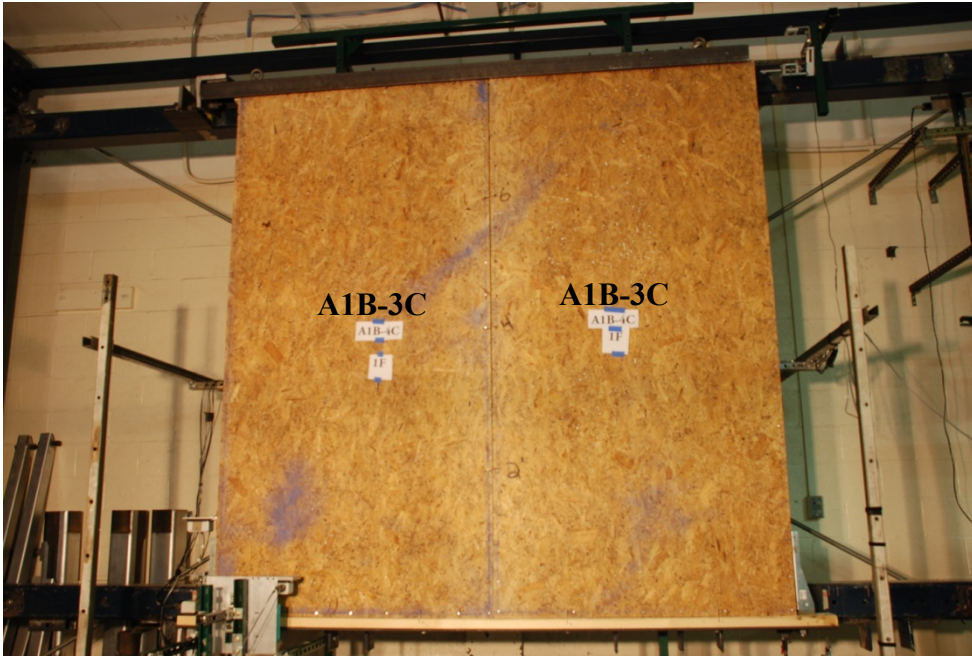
Specimen A1Bearing-3C before Fatigue 1
